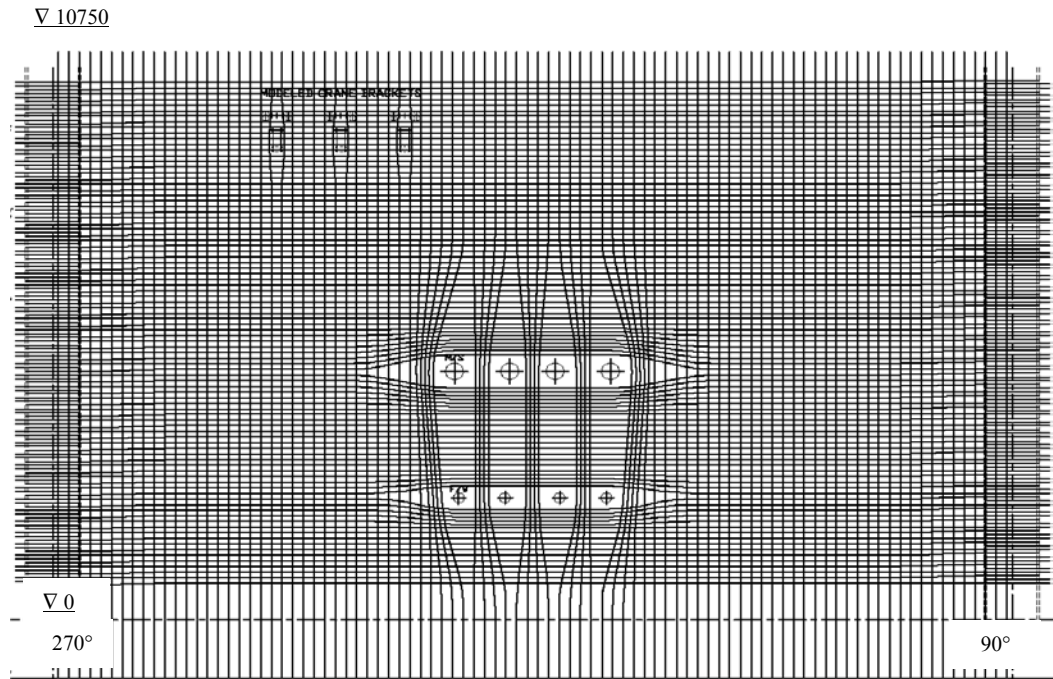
Layout of the penetrations (elevation, outside containment).
